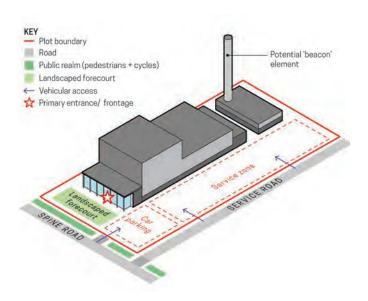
An example plot arrangement for a large-scale industrial facility incorporating a building frontage onto a spine road.
